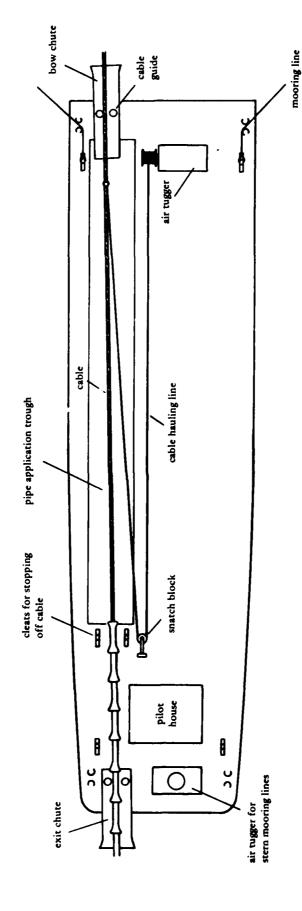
Typical LCM 6 configuration for under-running pipe application.
